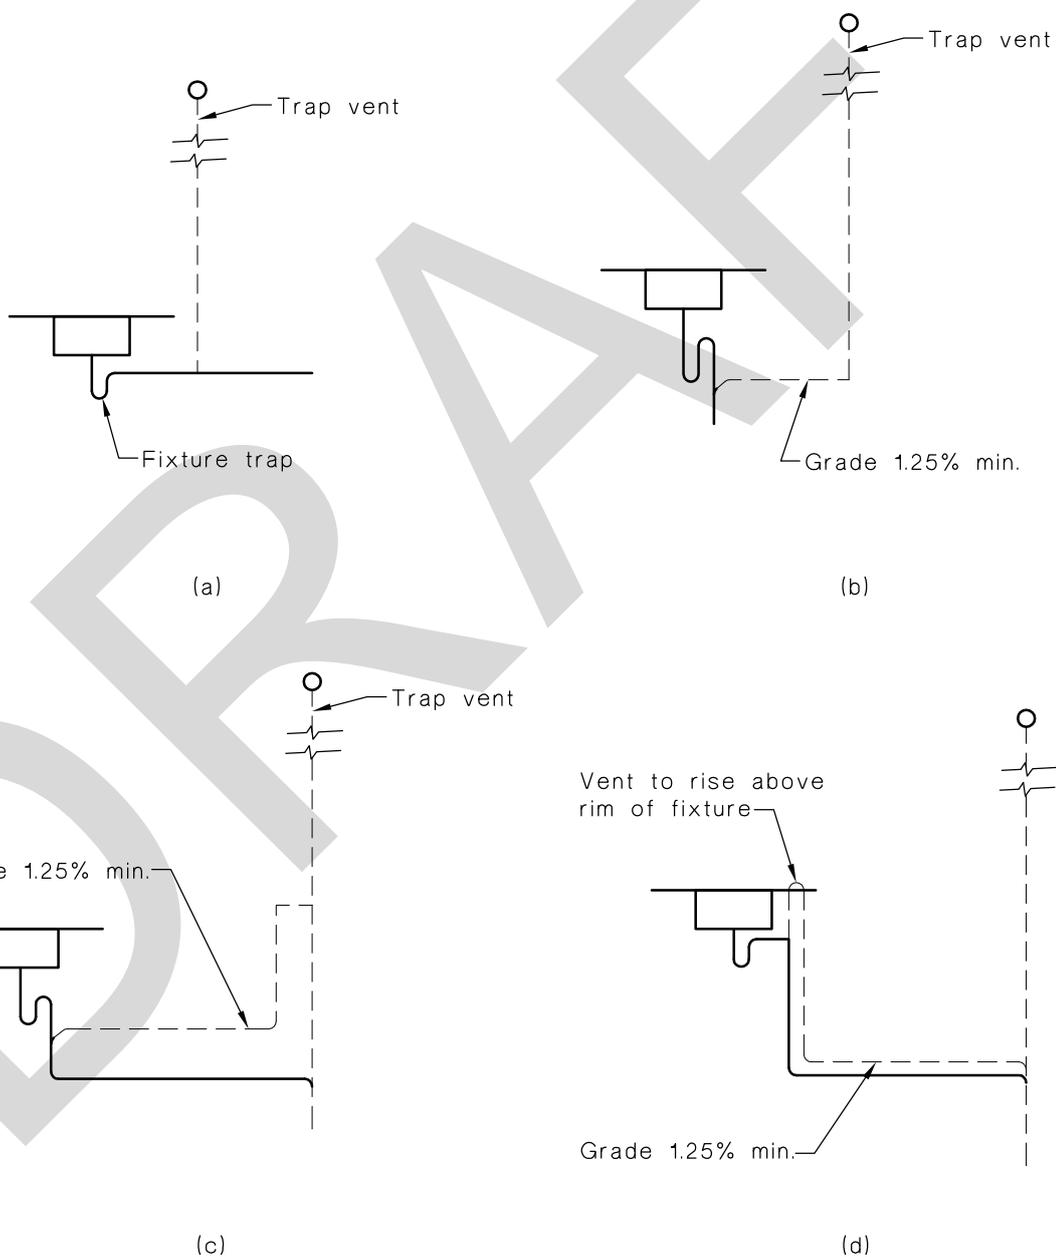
TYPICAL INSTALLATION OF TRAP VENTS
